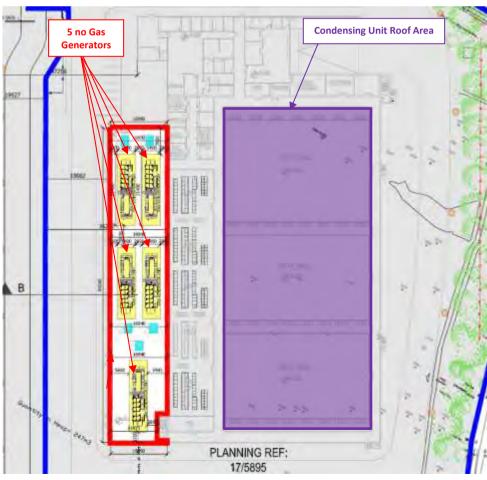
Proposed Little Island Data Centre Development Layout - Building 1
